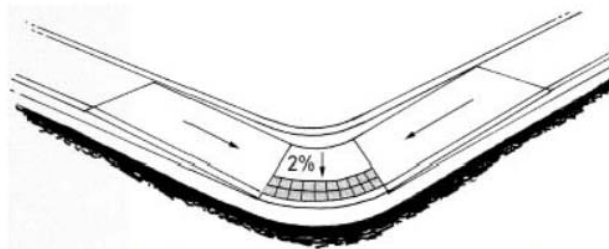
On narrow sidewalks with tight turning radii, a single parallel curb ramp may be considered.
